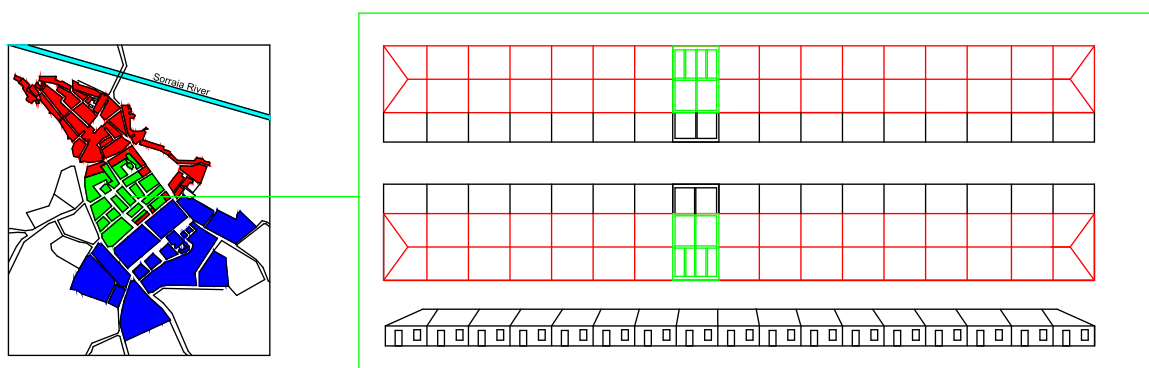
Linear building agglomerates constructed in Benavente after the 1909 earthquake.
